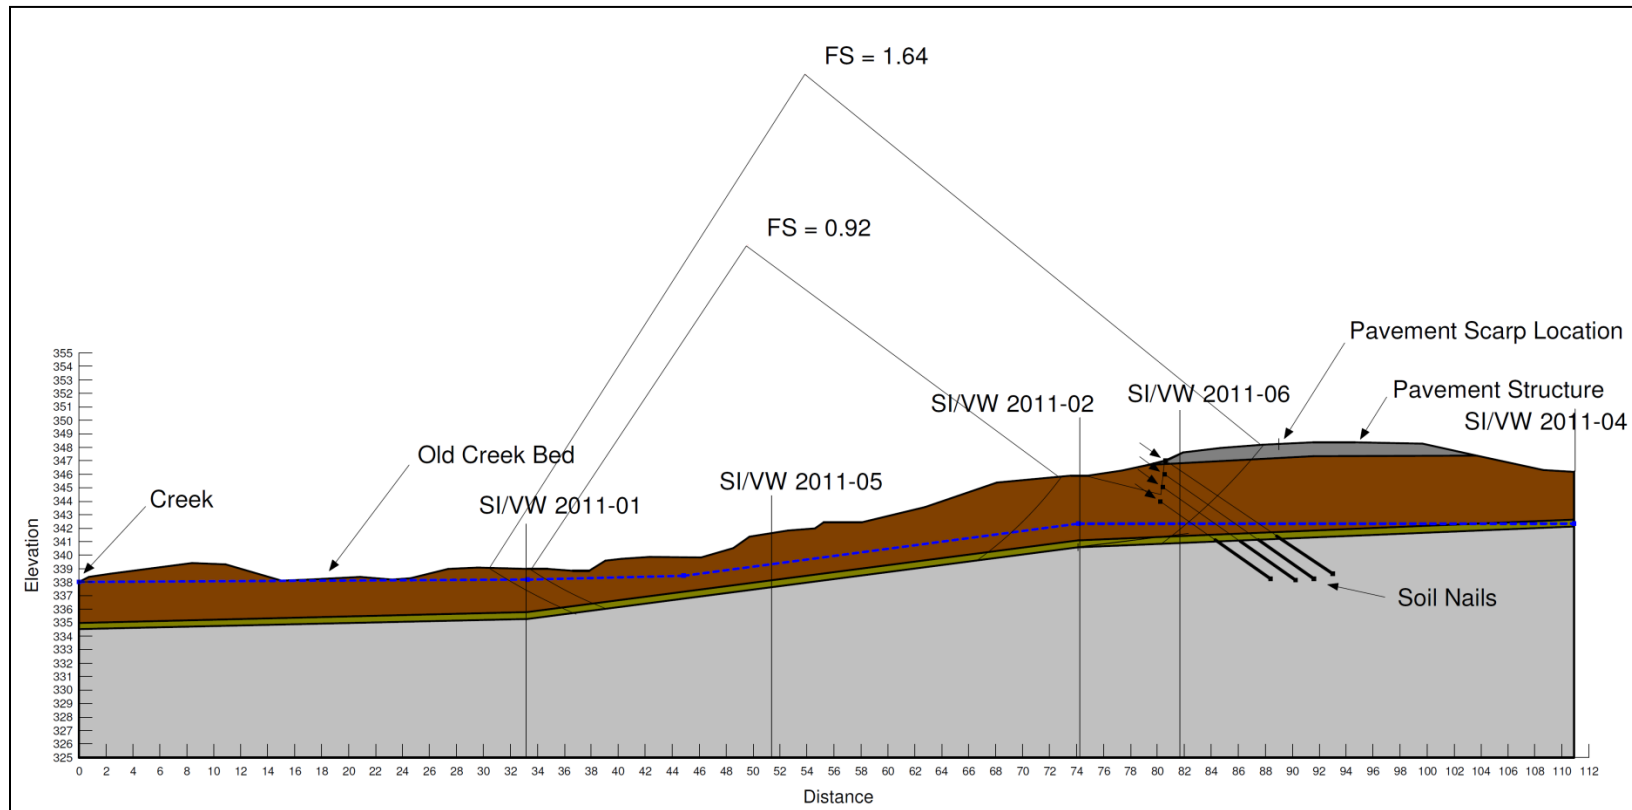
Soil Nail Stabilization, Local Stability at Road Edge
